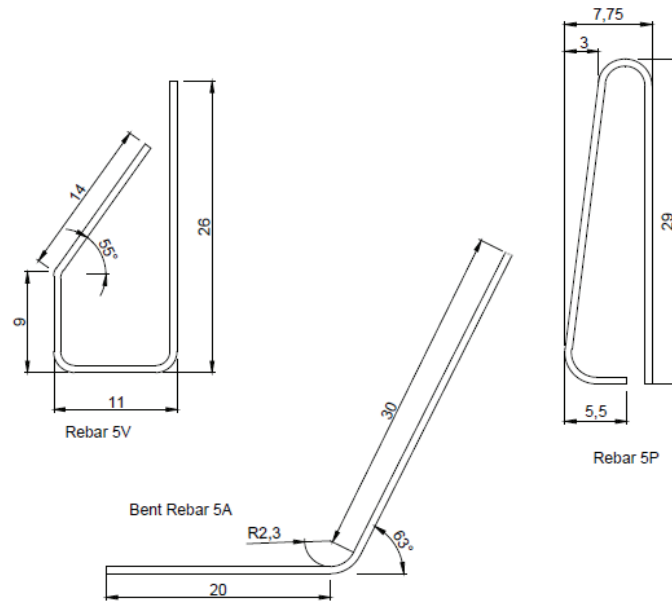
Rebar used in Halls River Bridge, typical section A-A South Side
